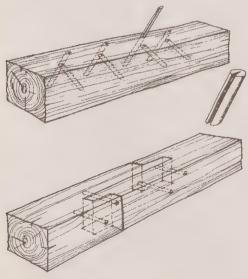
Dowelling with rods of wood or other material bedded in a suitable adhesive.
